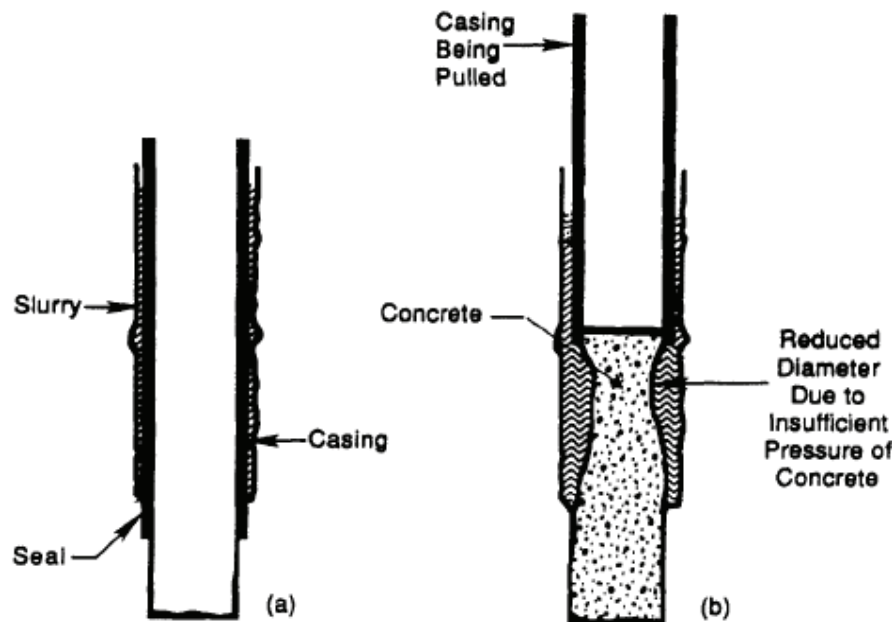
Pulling Casing with Insufficient Head of Concrete
